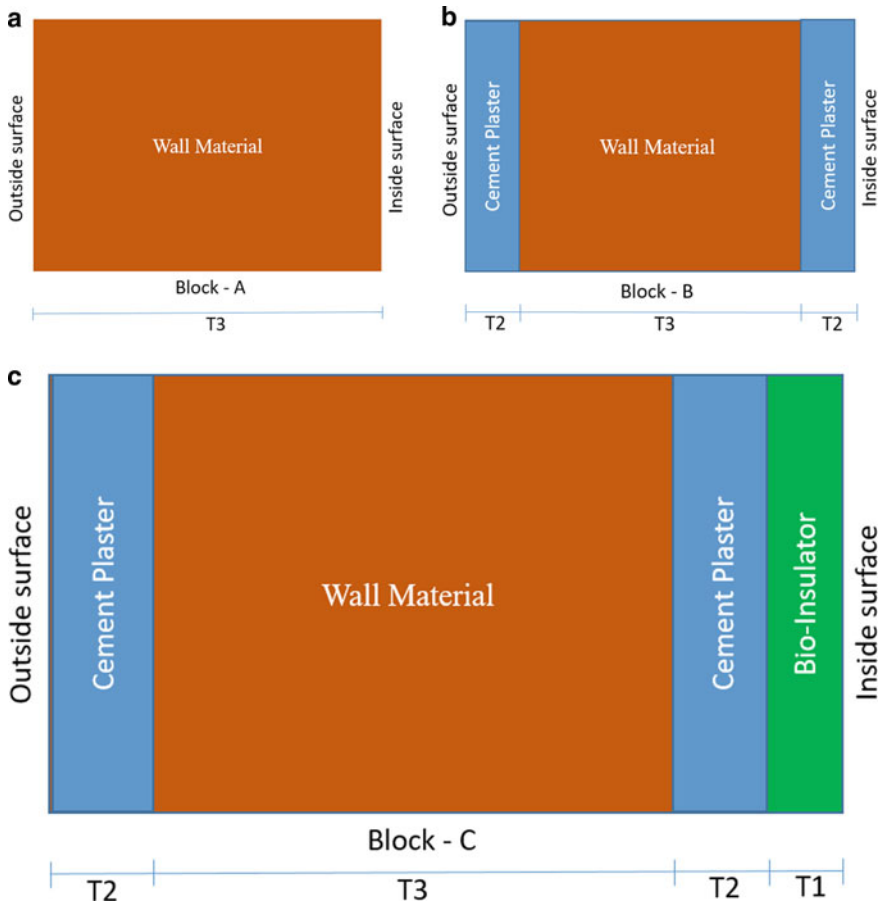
a Homogeneous wall. b Composite cement plaster wall. c Composite wall made with both cement plaster and bio-insulation
